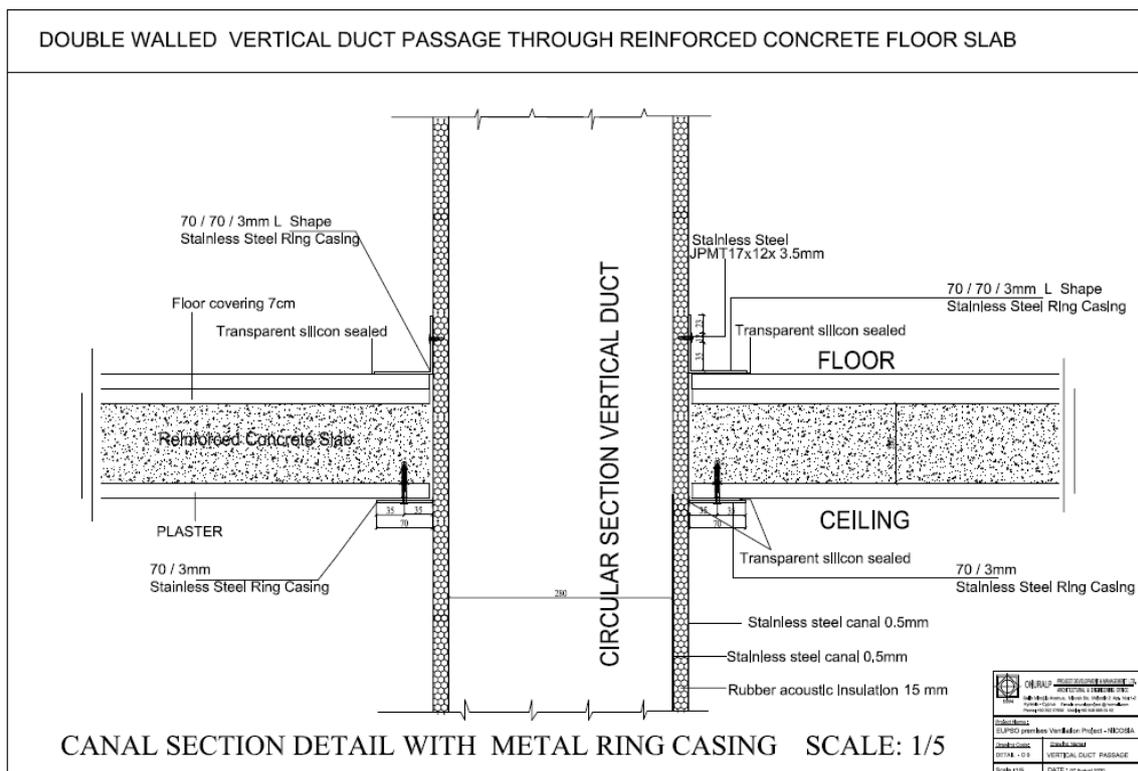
Vertical Duct Passage through Reinforced Concrete with Casing – EUPSO project detail no:9
